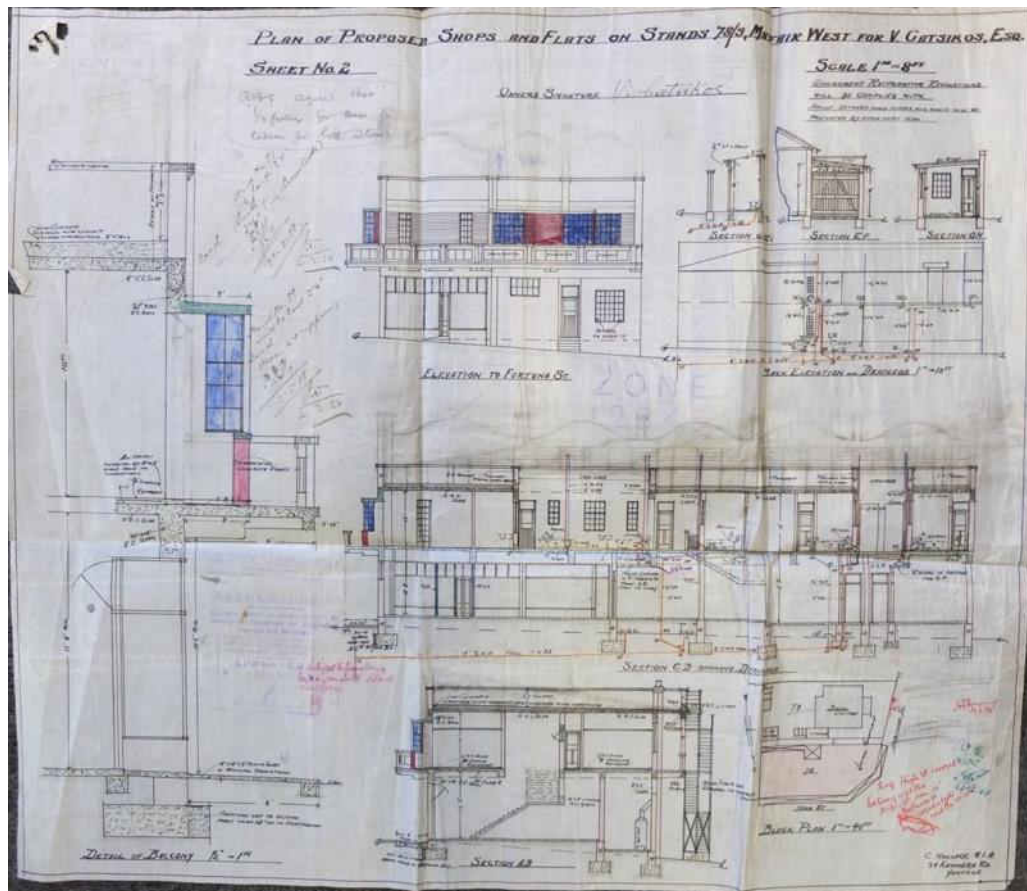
Plans of proposed shops and flats on Stand 78/9, plan shows site plan, sections and elevations
